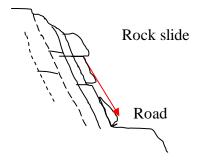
Rock Slope Collapse (RC) along Kennon Road
